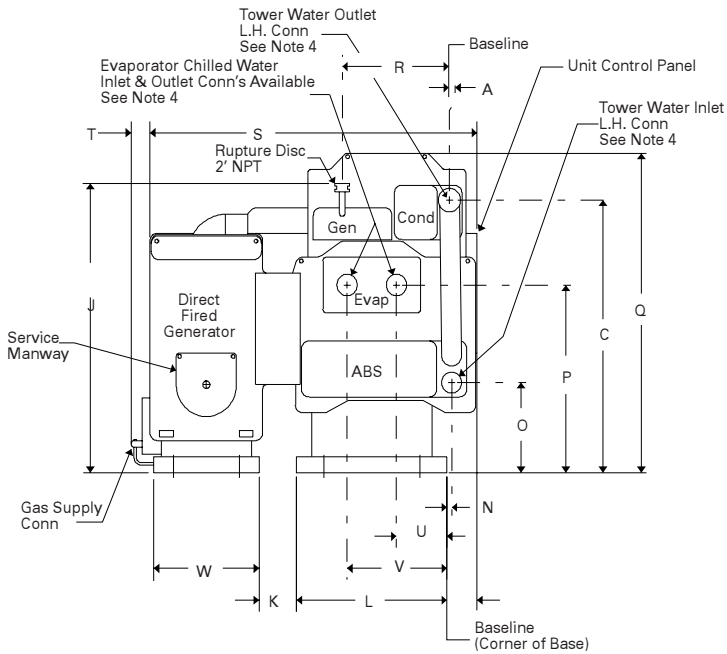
Right End Elevation - ABDA 575, 660, 750
